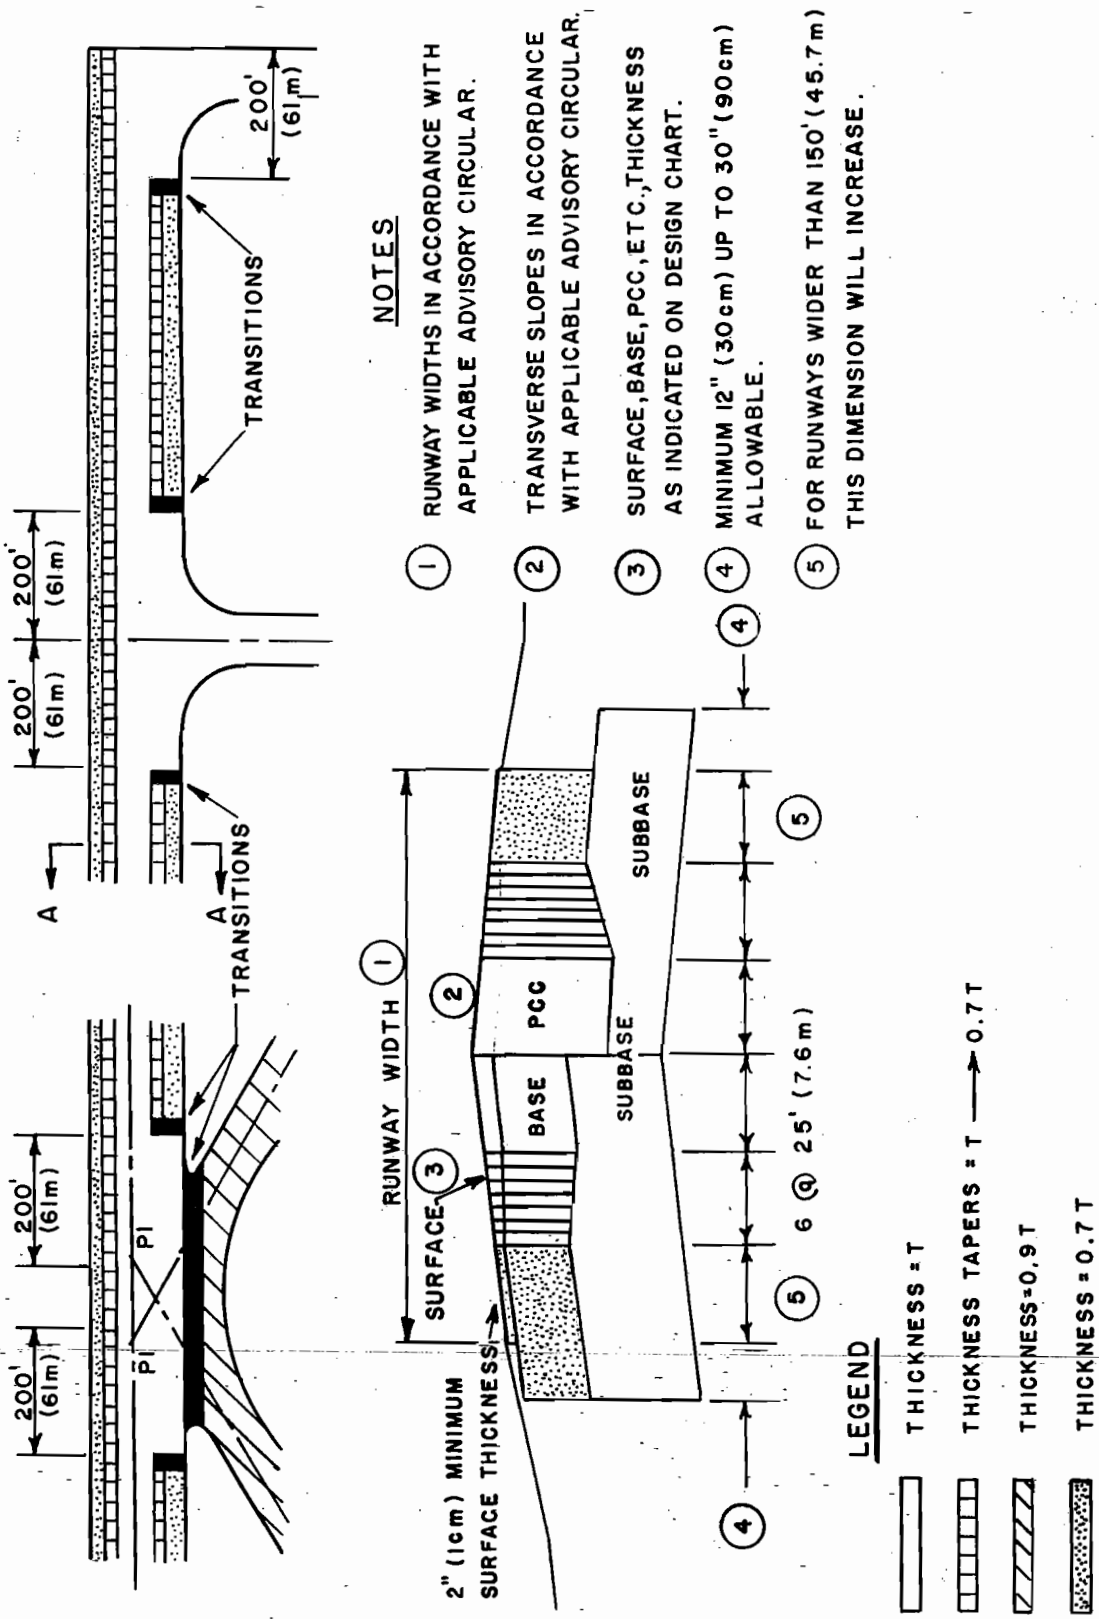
TYPICAL PLAN AND CROSS SECTION FOR RUNWAY PAVEMENTS
